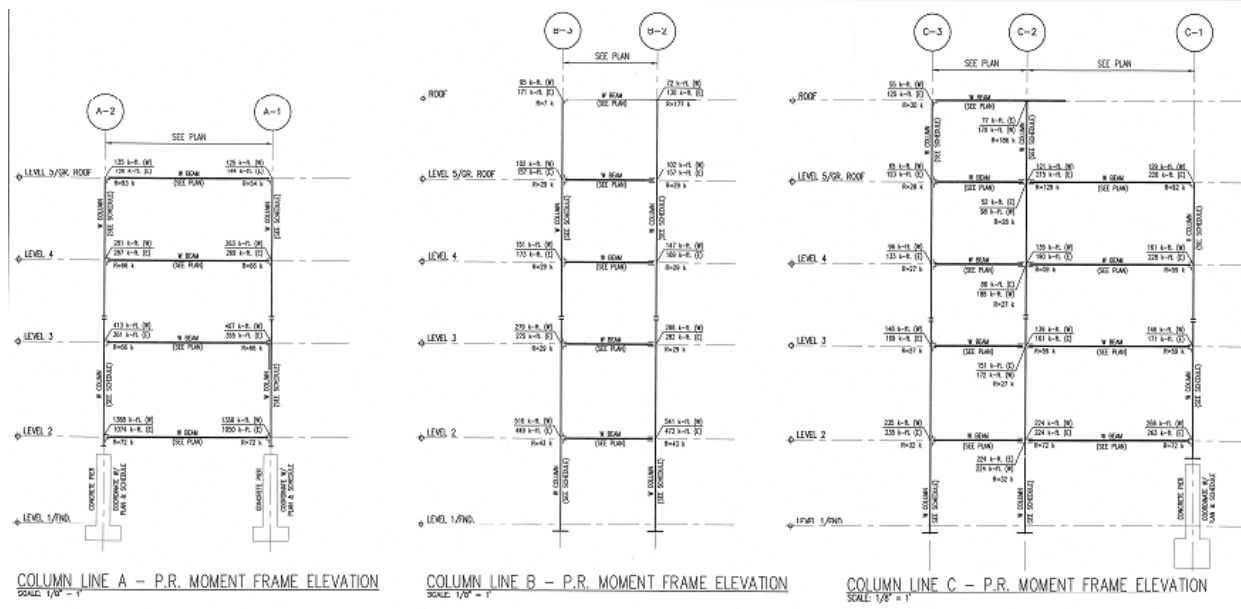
P.R. Moment Frame Elevations (A, B, and C)
